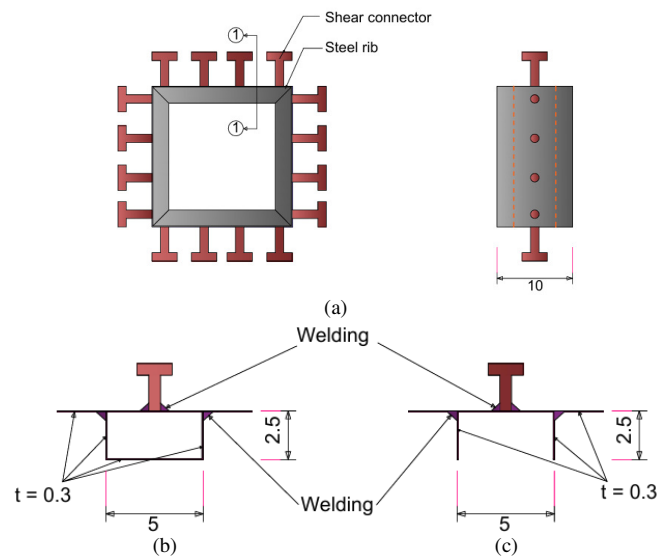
FSSRs details. (a) Cross section, (b) closed section, and (c) open section.
